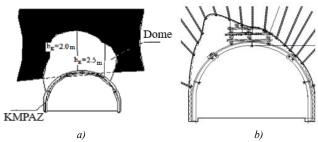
Disruption of the contour and collapse of roof and sidewall rocks during the formation of domes when crossing a tectonic fault: a) in the centre of the ceiling, b) in the domes.
